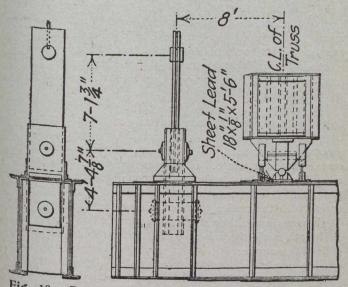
Detail of Lifting Girders, Suspected Casting and Ends of Lifting Links.
